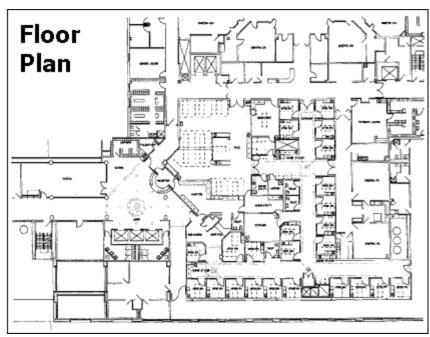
Suite floor plan. The patient rooms are served by a common corridor, which features three nurse stations at primary circulation nodes.
